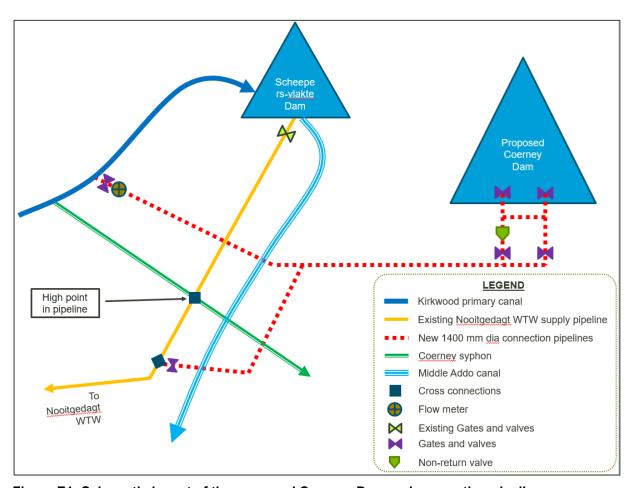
Schematic layout of the proposed Coerney Dam and connecting pipelines
